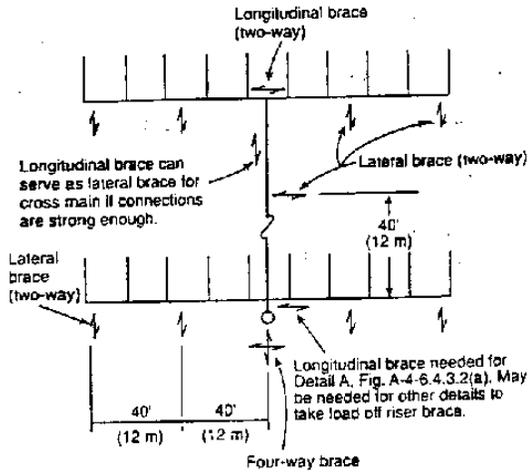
(b) Typical location of bracing on a tree system.
